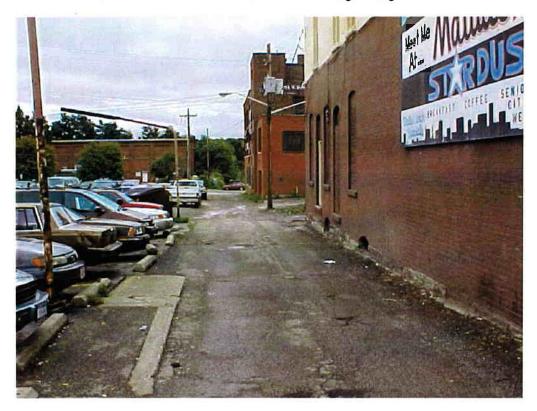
East side of the building showing Rose Alley and parking lot, facing south.
